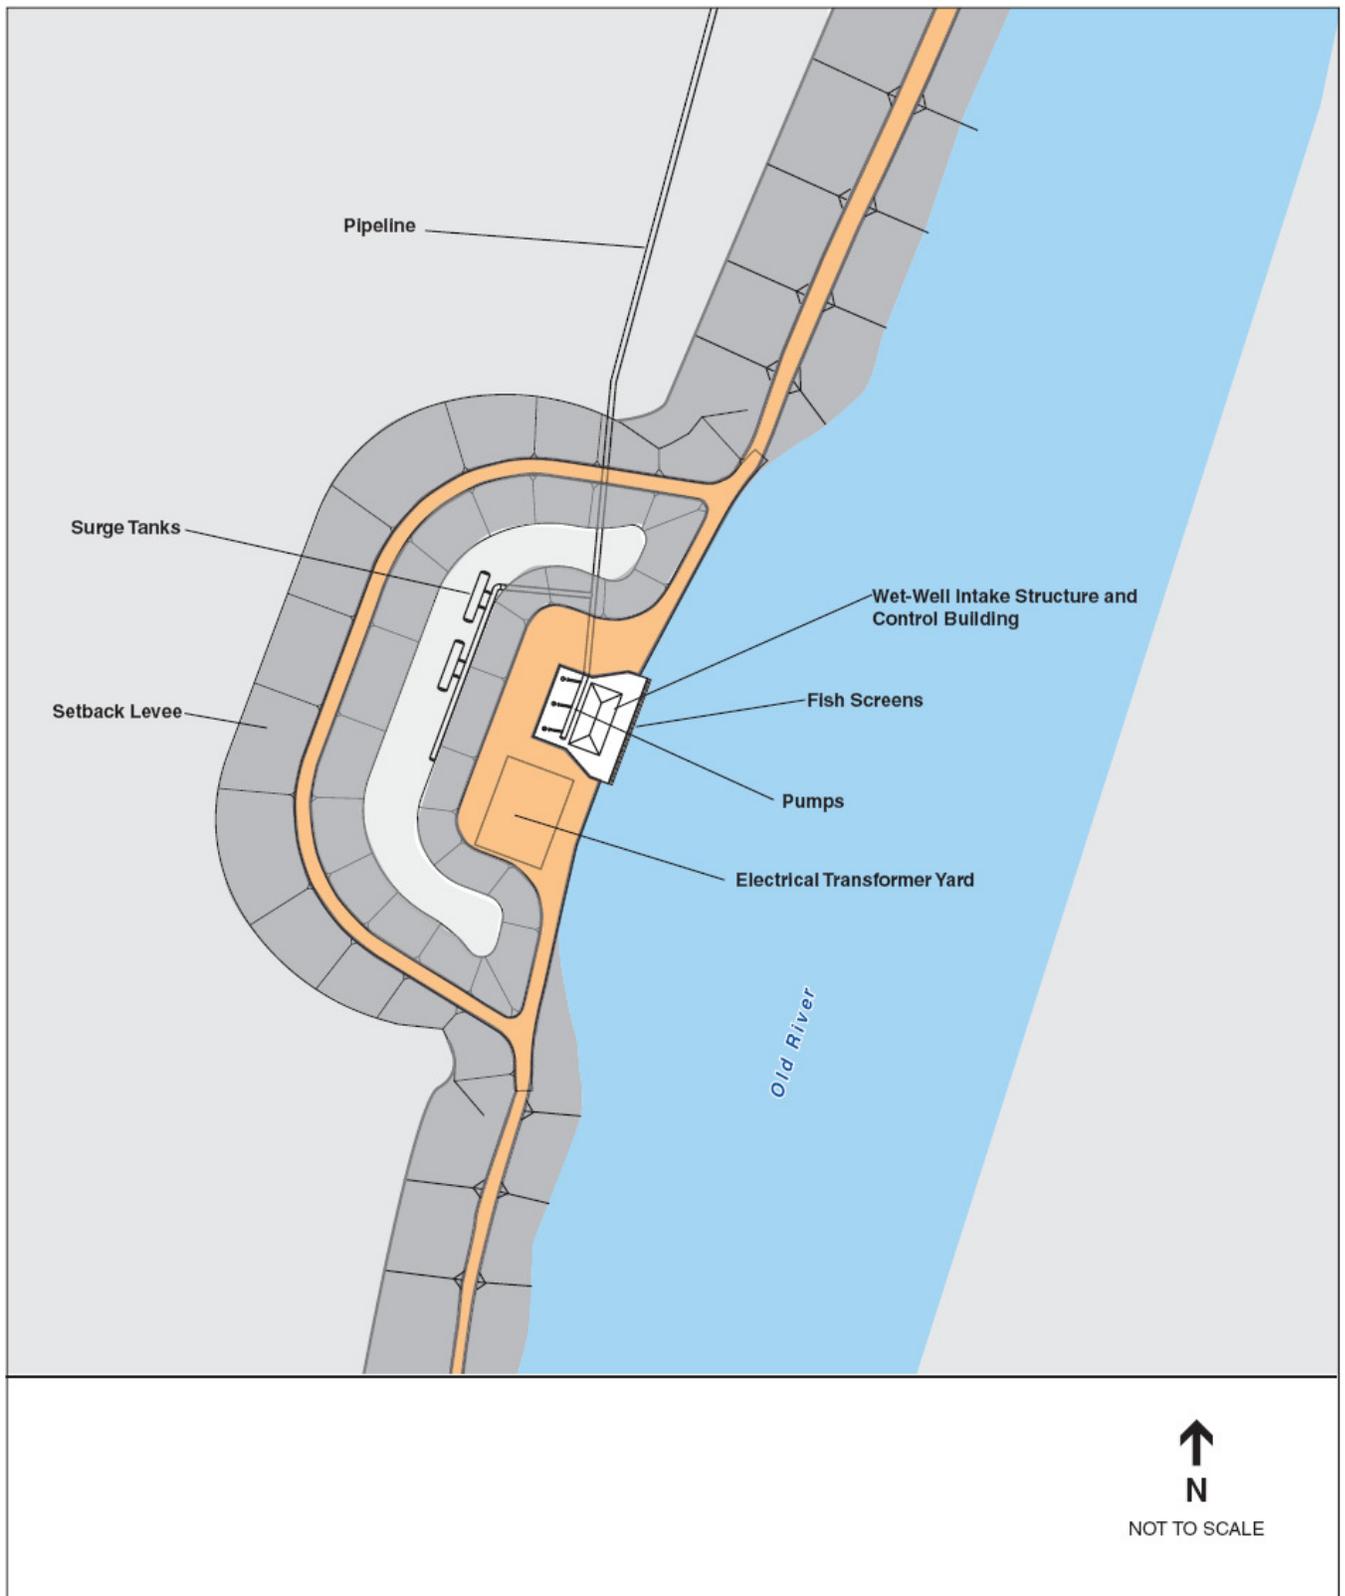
New Delta Intake and Pump Station – Conceptual Layout
